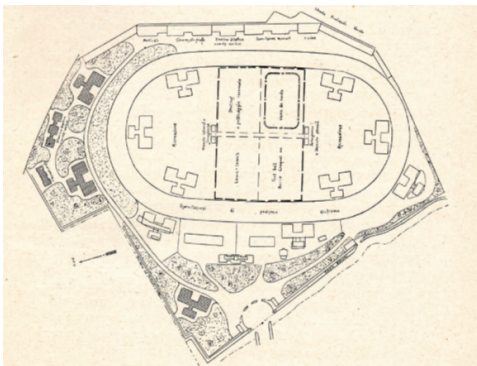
Plan of the "Casa del Sole" (formerly "Umberto di Savoia" outdoor school)⁶
